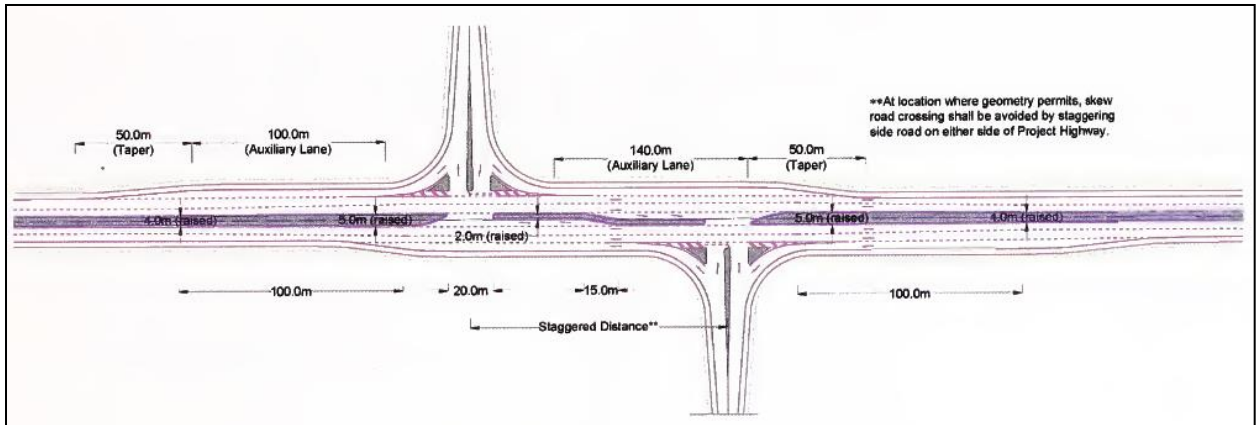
Layout for Staggered Intersection (with Right Turn Protected Arrangement)
